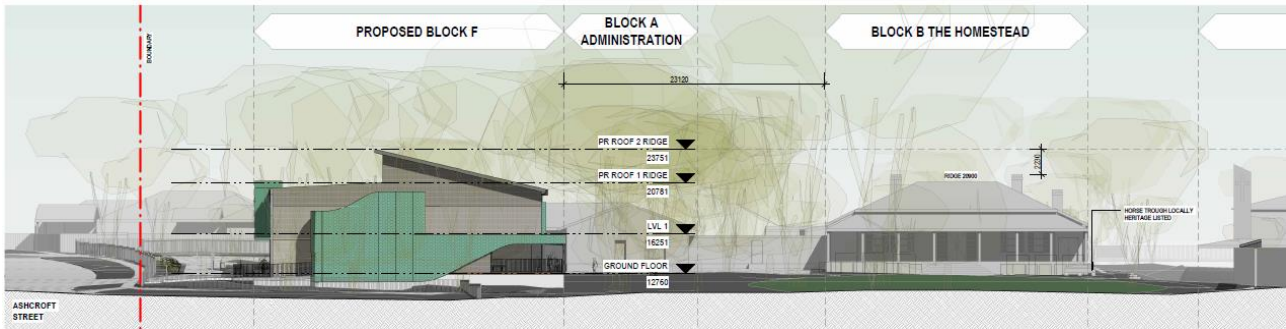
Site section of the northern elevations of proposed Block F and The Homestead (Source: Leaf Architecture)
